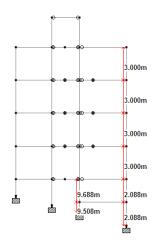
Elevation of residential building on 15 deg. Slope
